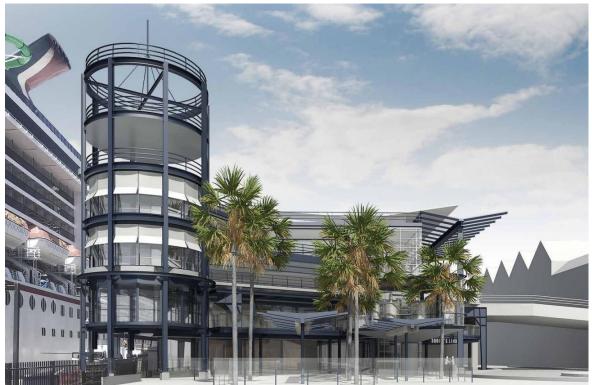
Proposed shade structures - Indicative north elevation (Source: C&T)
